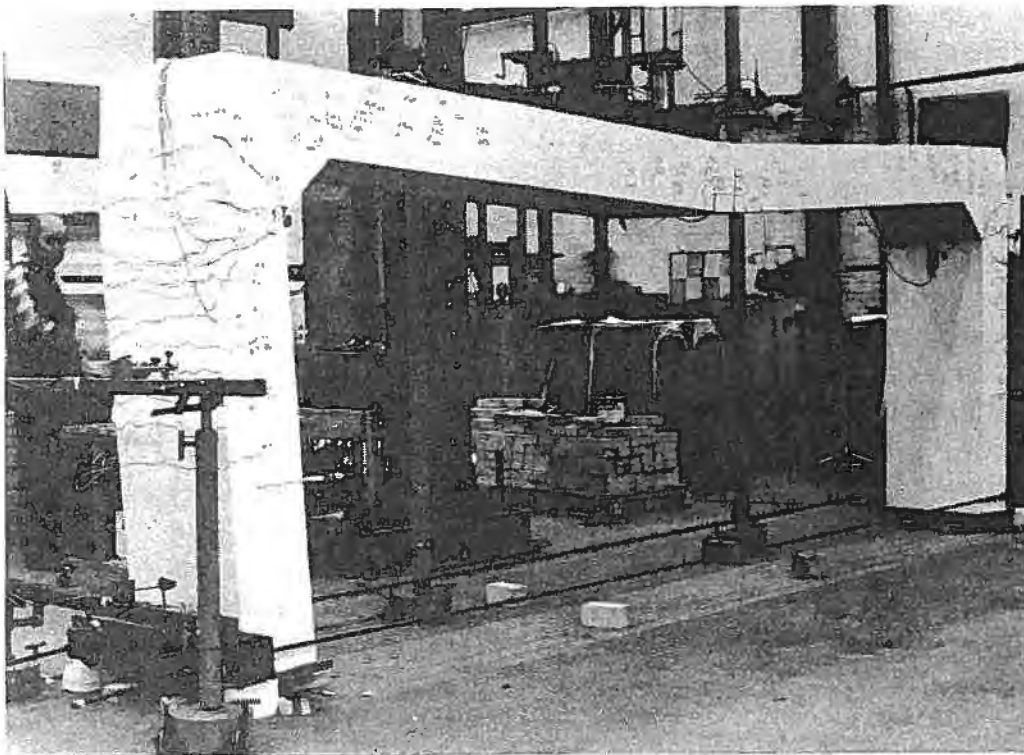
Deformed frame during the test, after development of plastic hinges, both under the frame corners and at mid-span of the bridge beam
